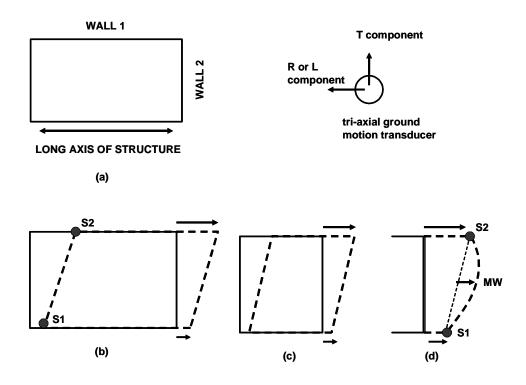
(a) Plan view of structure showing nomenclature for walls, (b) wall 1 and (c) wall 2 whole structure shearing, and (d) typical mid-wall bending
